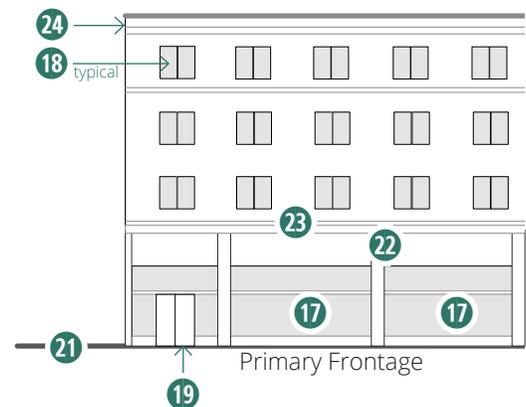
Storefront Building Elevation: Facade Design Requirements
